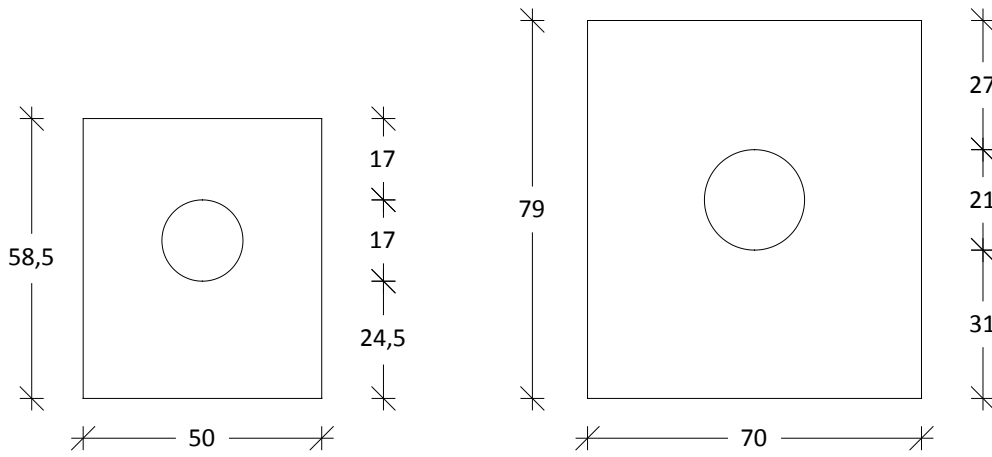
Dimensions of base plates type R Lx60x60x3,0 (left) and R Lx80x80x3,0 (right)
